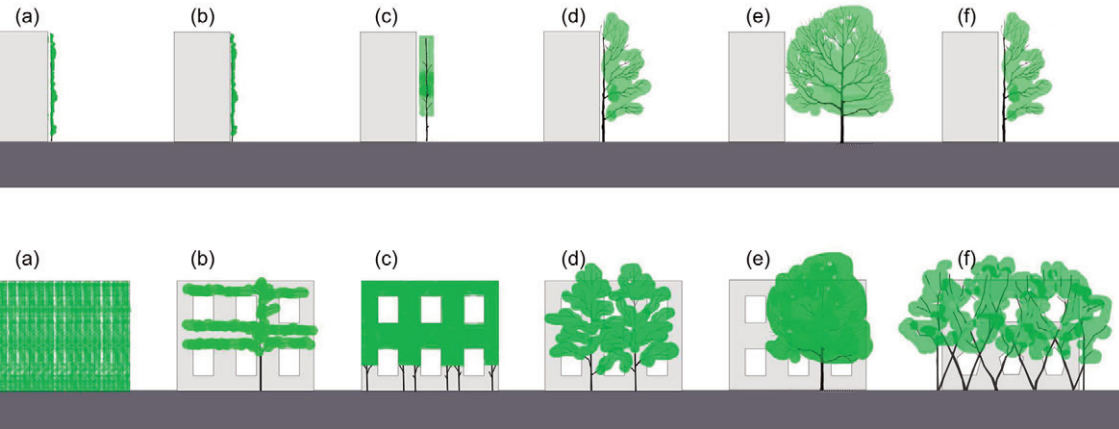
| Section and elevation of (a) ground-based façade greening with climbers, (b) espalier tree, (c) hedge façade, (d) tree façade (e) tree in front of a building, (f) façade of inoculated trees (credit: L. Höpfl).
